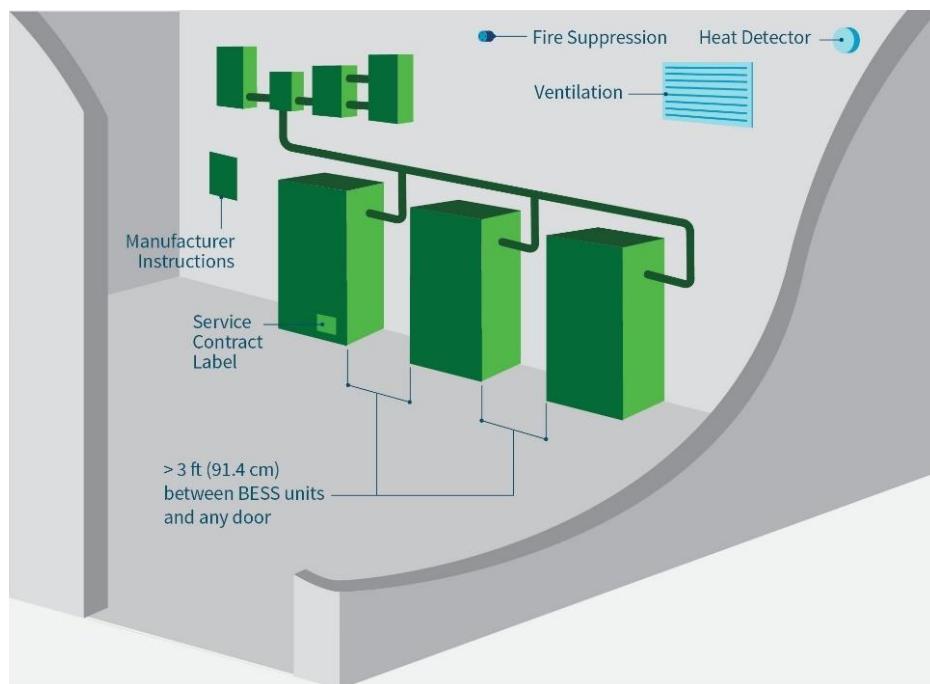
BESS Installation Requirements for a Non-Dedicated Use Building
